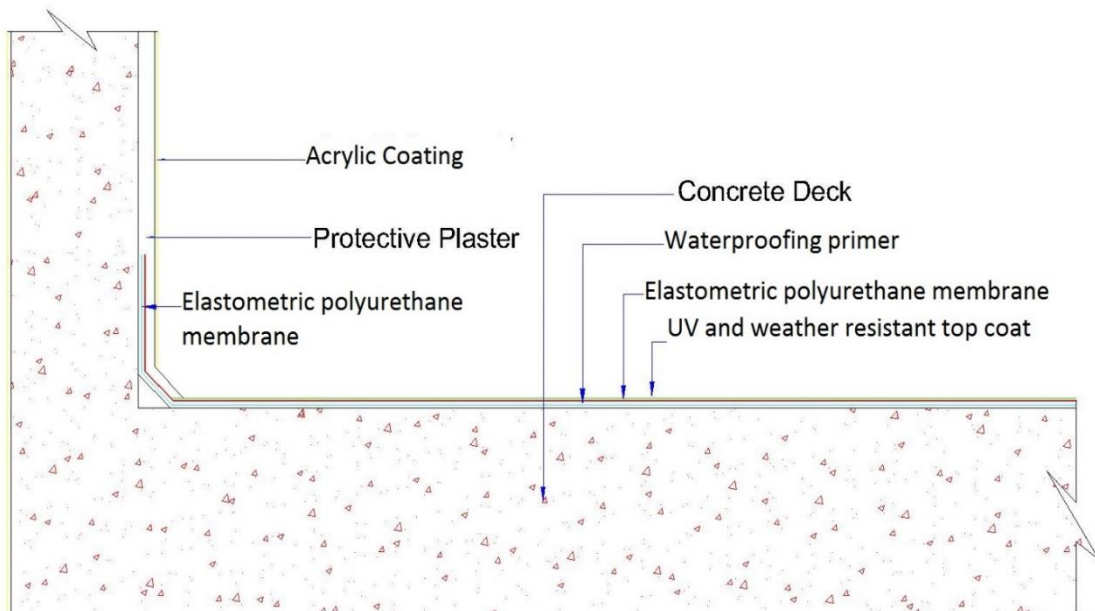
Waterproofing of Exposed Driveways and Ramp Slabs
